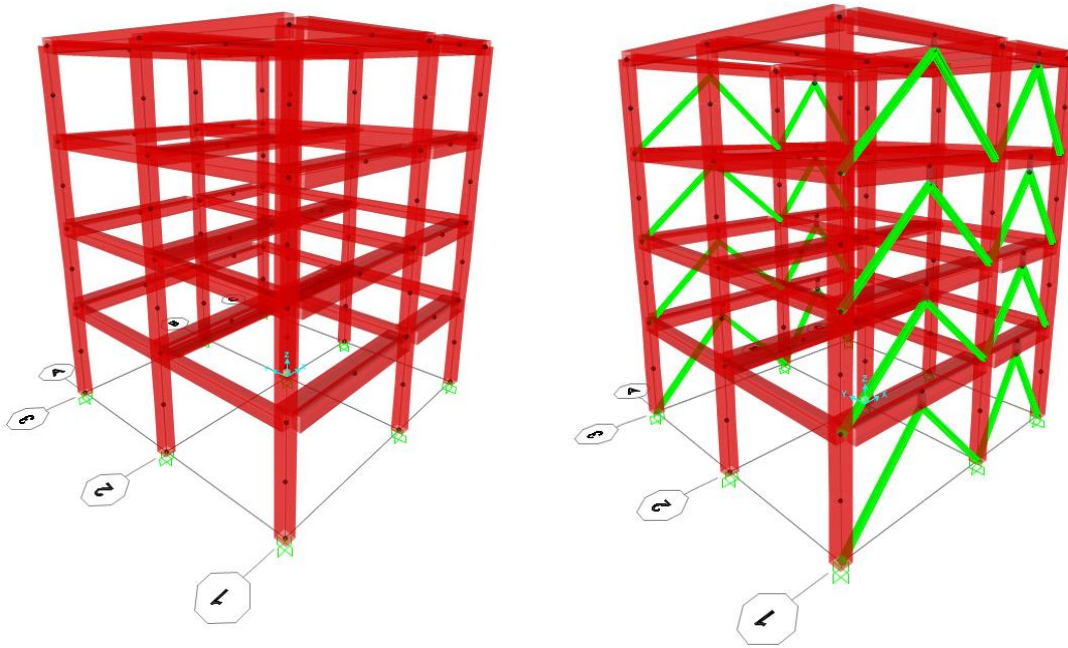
3D model of the pre-retrofit building and the retrofit building with metallic dampers.
